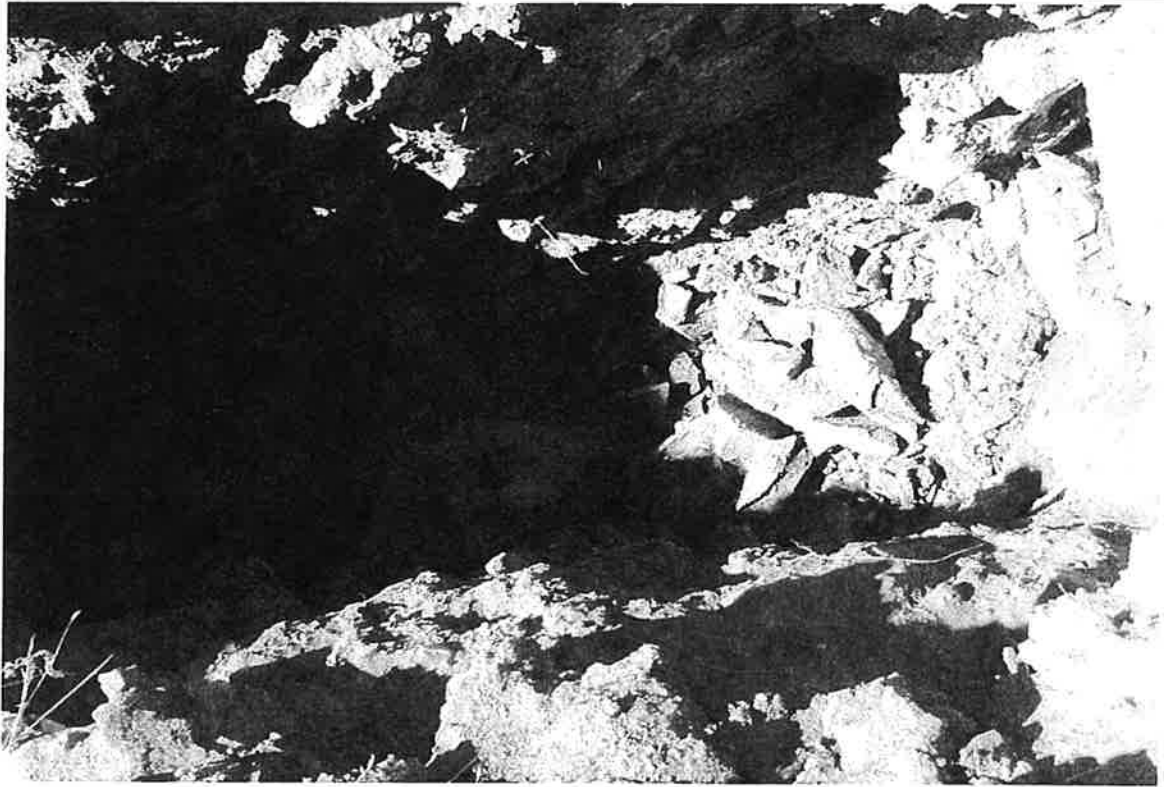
Seepage in Test Pit TP-4 near pond and marsh area
